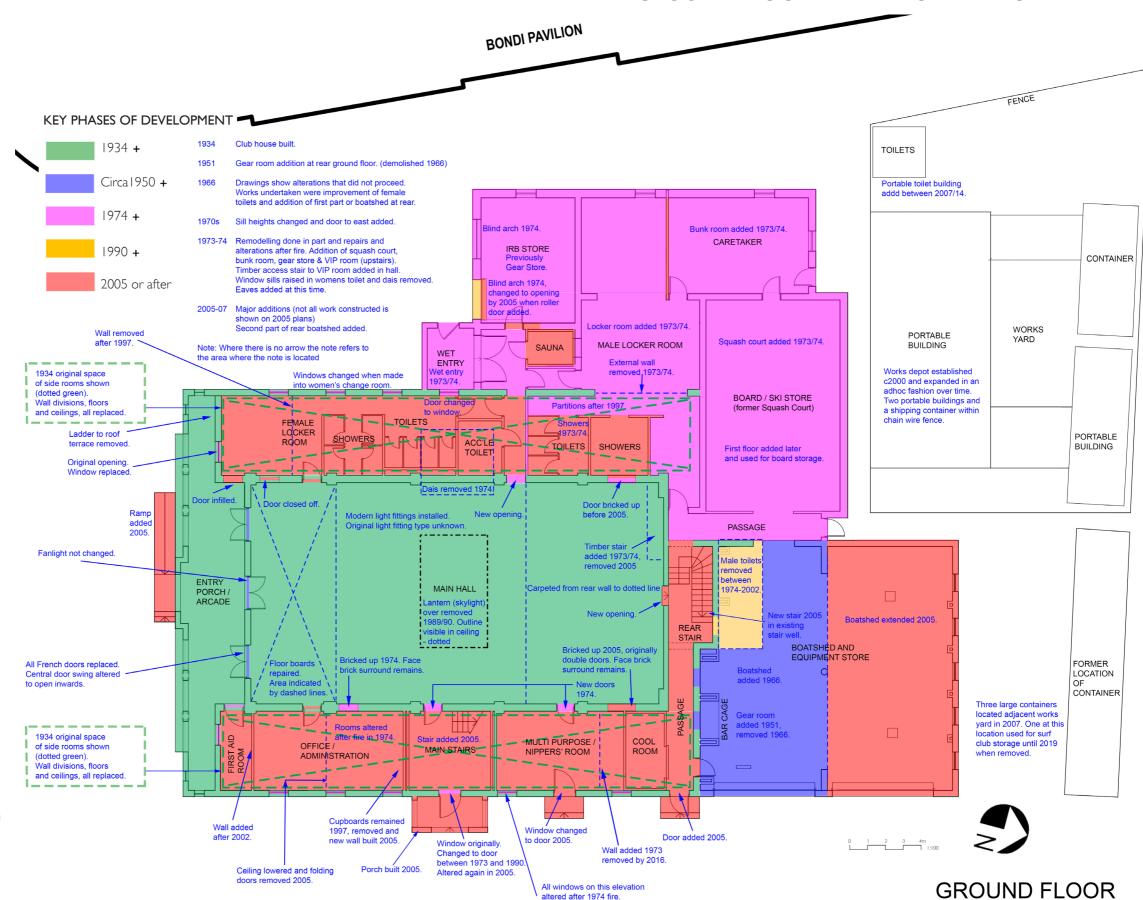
GROUND FLOOR PLAN PHASES OF DEVELOPMENT
